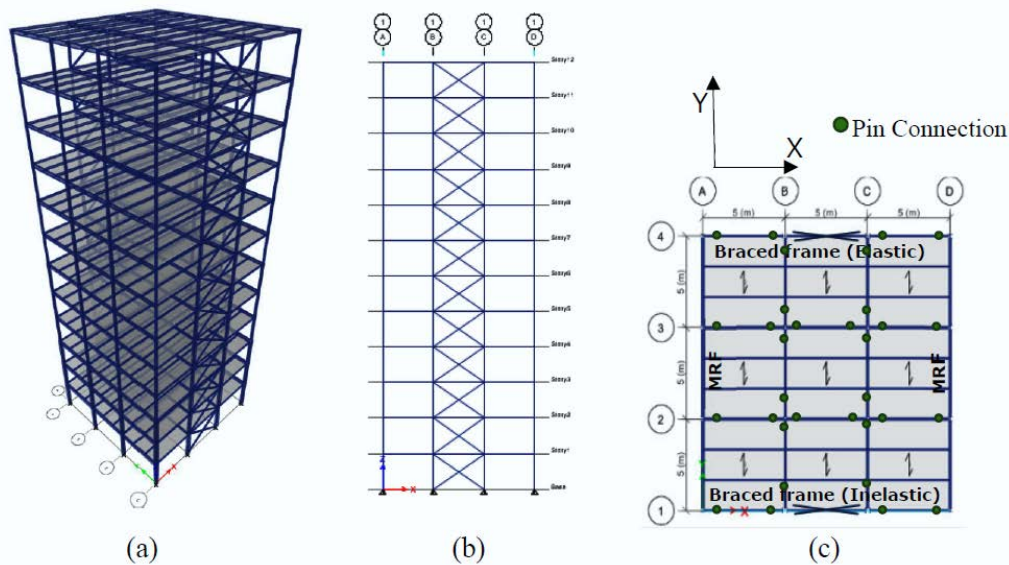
Building model: a) 3D View, b) Elevation view and c) Plan view
